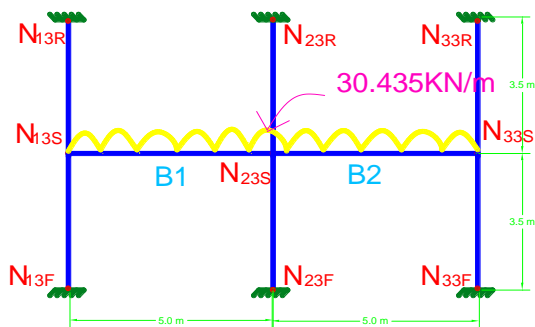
Substitute Frame -1 for the Second Floor Beam B1 - B2 (SSF1)
